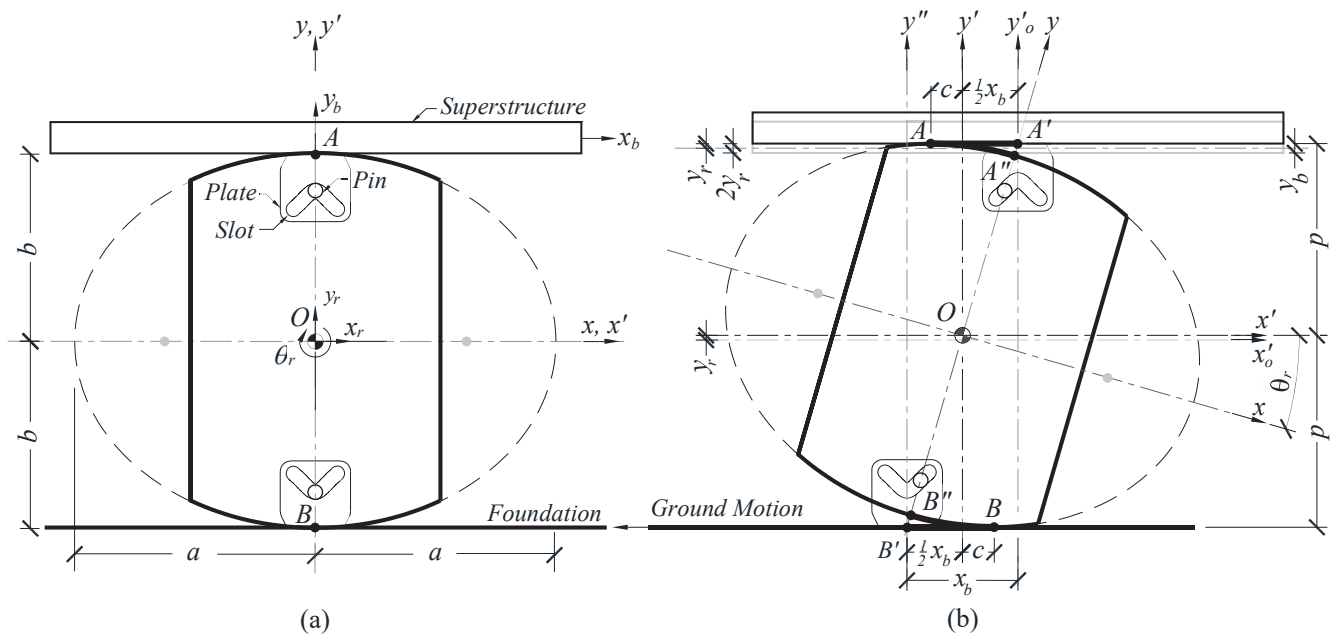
Rolling Elliptical Pendulum Model, Adapted to Load-Bearing Wall Panel from (Jangid and Londhe)
